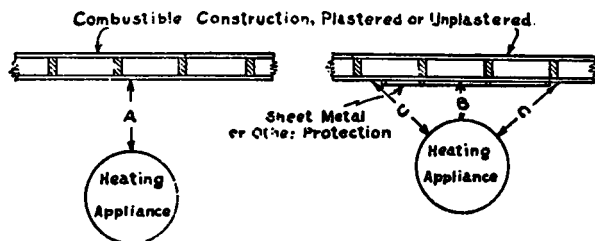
Sheet metal or other protection to reduce required clearance from heating appliance.
